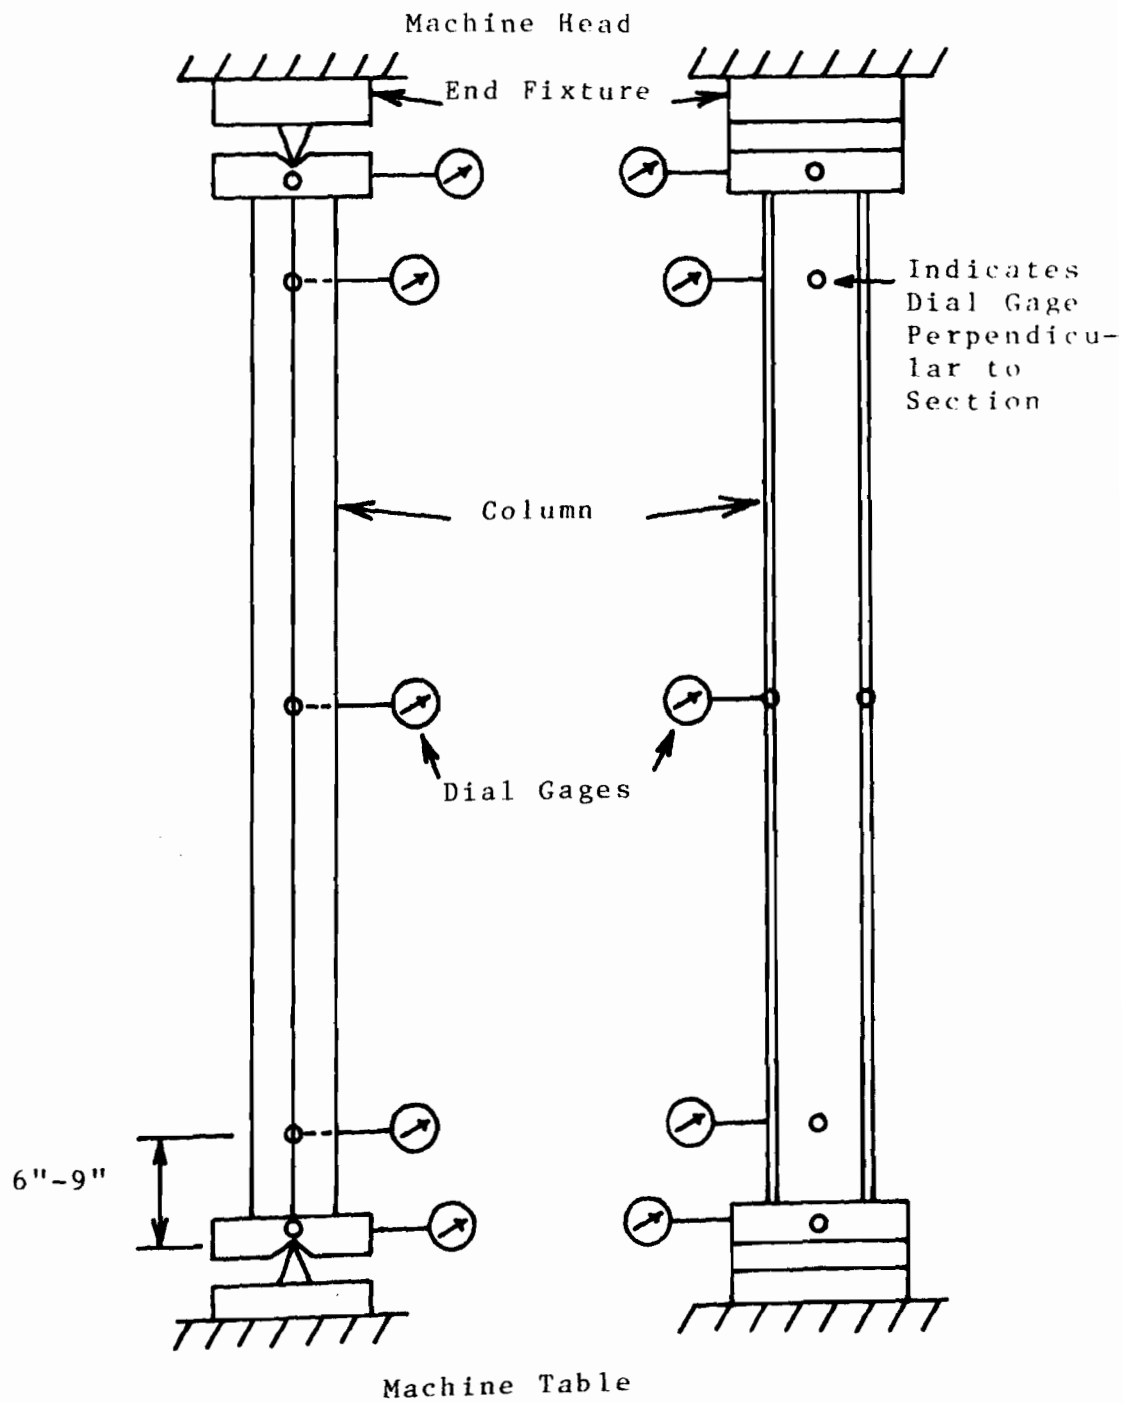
LOCATION OF DIAL GAGES LONG COLUMN TESTS
